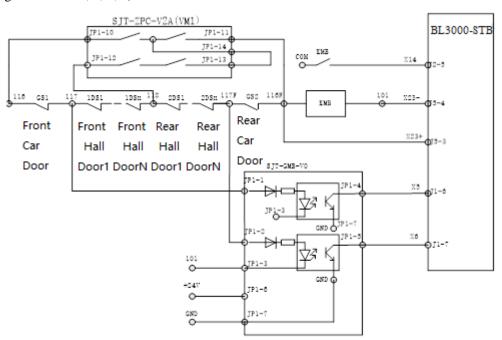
rear door mode: floor/car-door short connected detection plan Suitable for synchronous traction machine)
